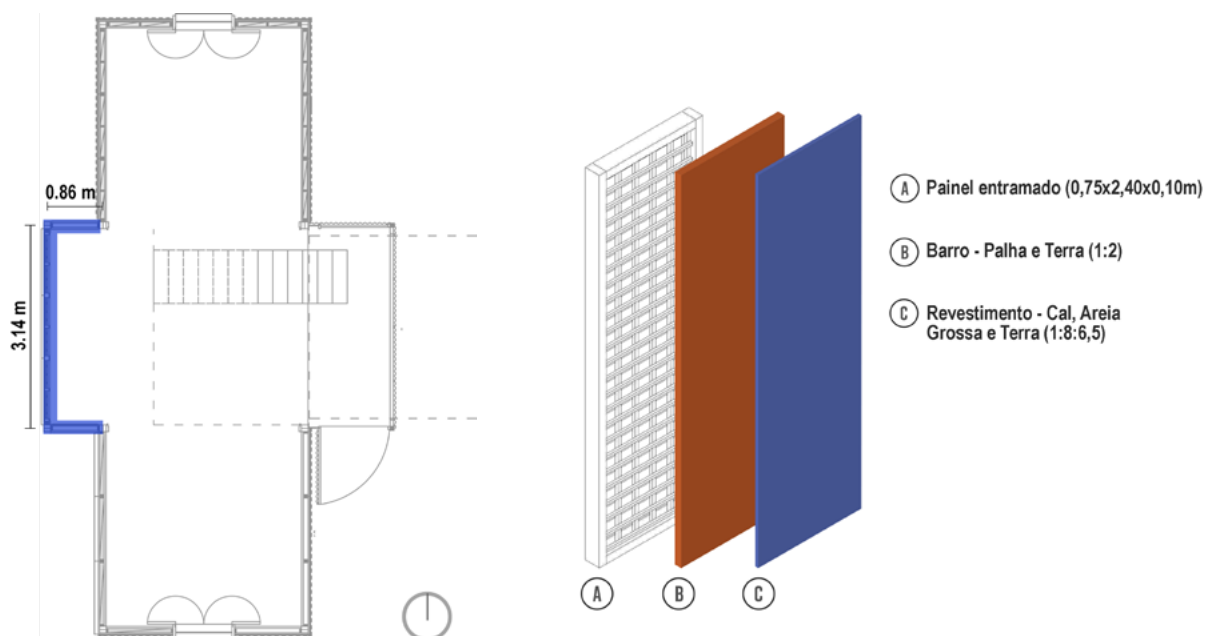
Plan and detailing of the wattle and daub panels of Unit 002 (Habís)
